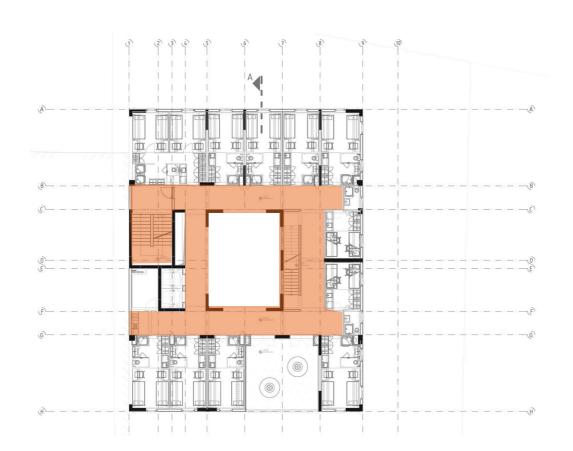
Republika Student Residences 3rd Floor Plan Source: Autoban
